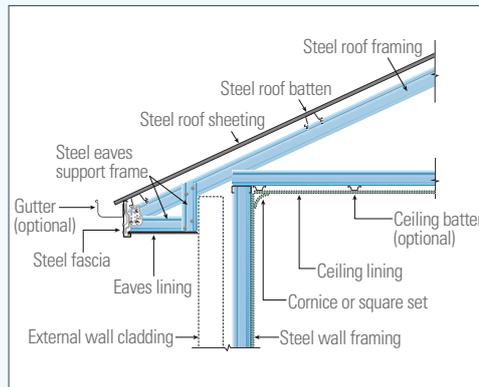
Roof system – with eave, BAL-12.5 to BAL-40
